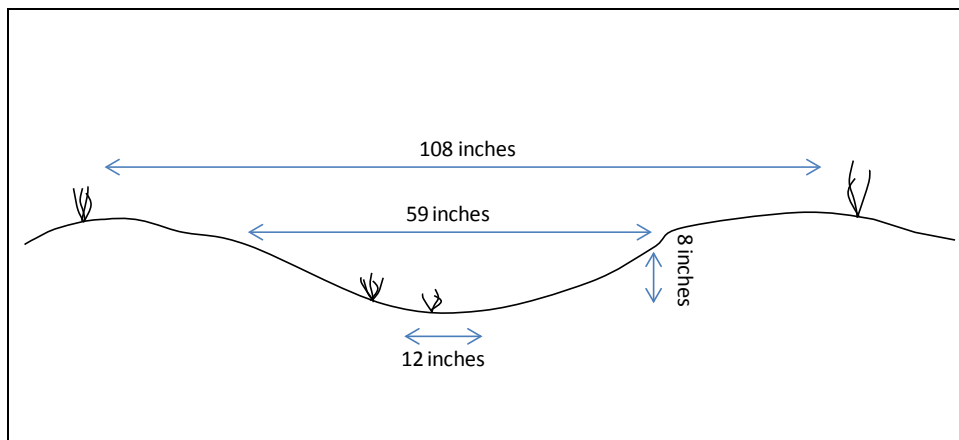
Schematic cross-section of ditch remnant intersecting west branch, facing south.
